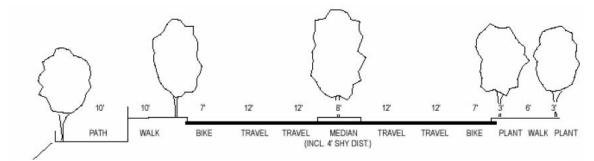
Cross-Section 100 Feet North of Clackamette Drive Overpass, Looking North
